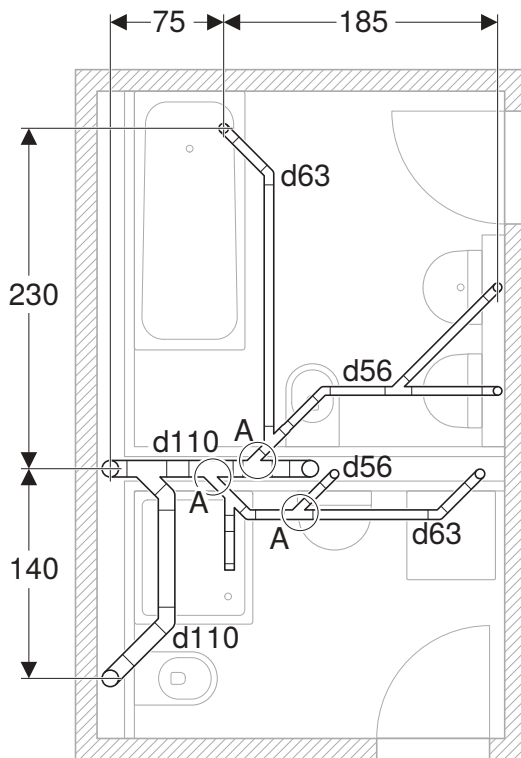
Design detail with reduced branch fittings 45° and pipe embedded in concrete ≤ 4 metres
